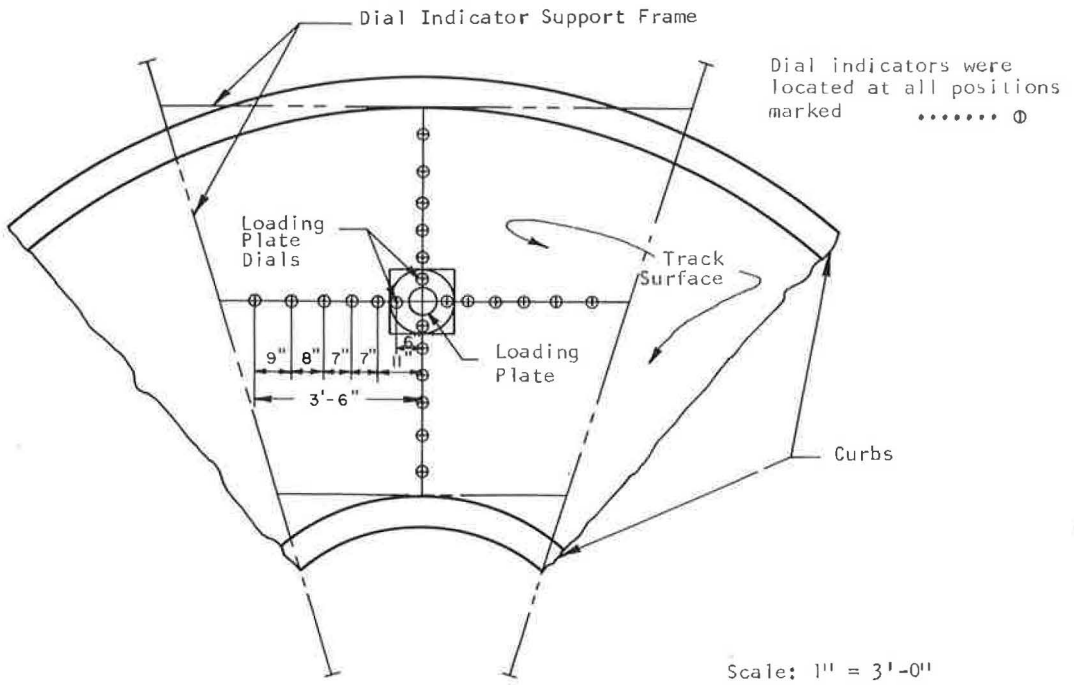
Plan view showing location of dial indicators for measuring surface deflection under static loads at interior point on pavement.
